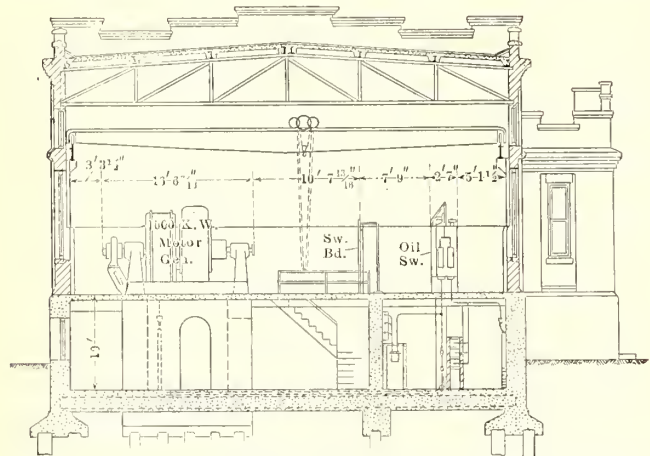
Detroit Tunnel—Cross-Section of Substation Along Line F-F Shown on Plan
